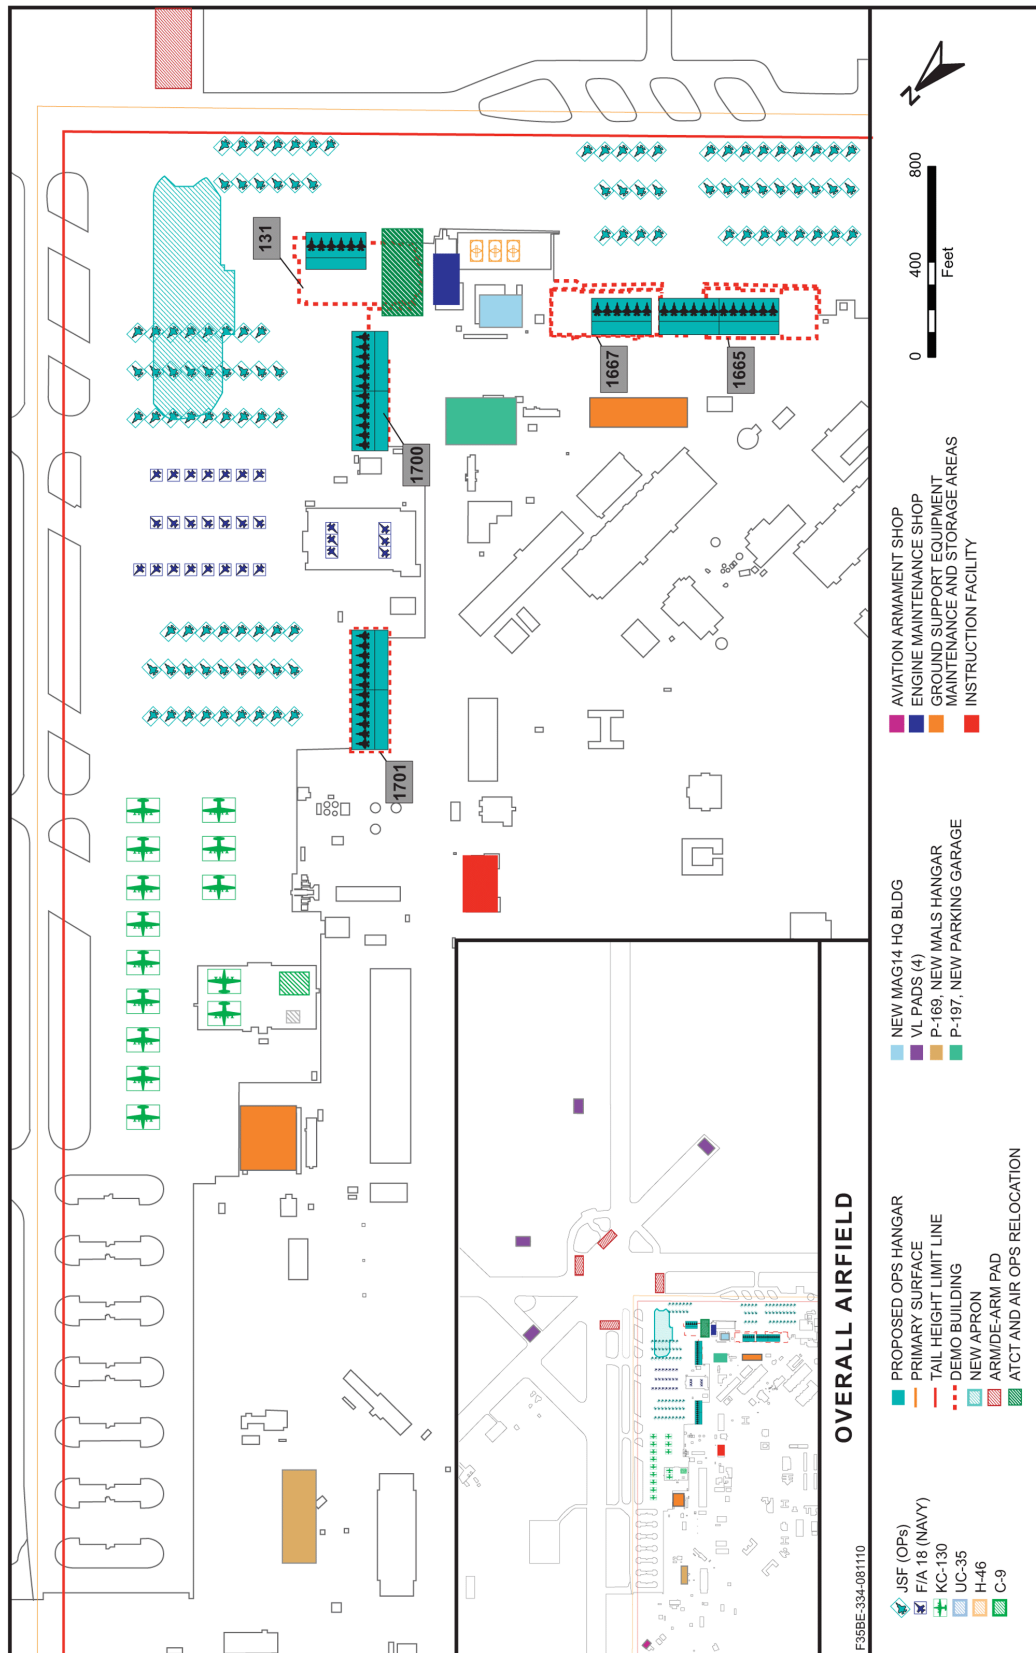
MCAS Cherry Point Proposed Flightline Construction and Support Facilities under Alternative 1
